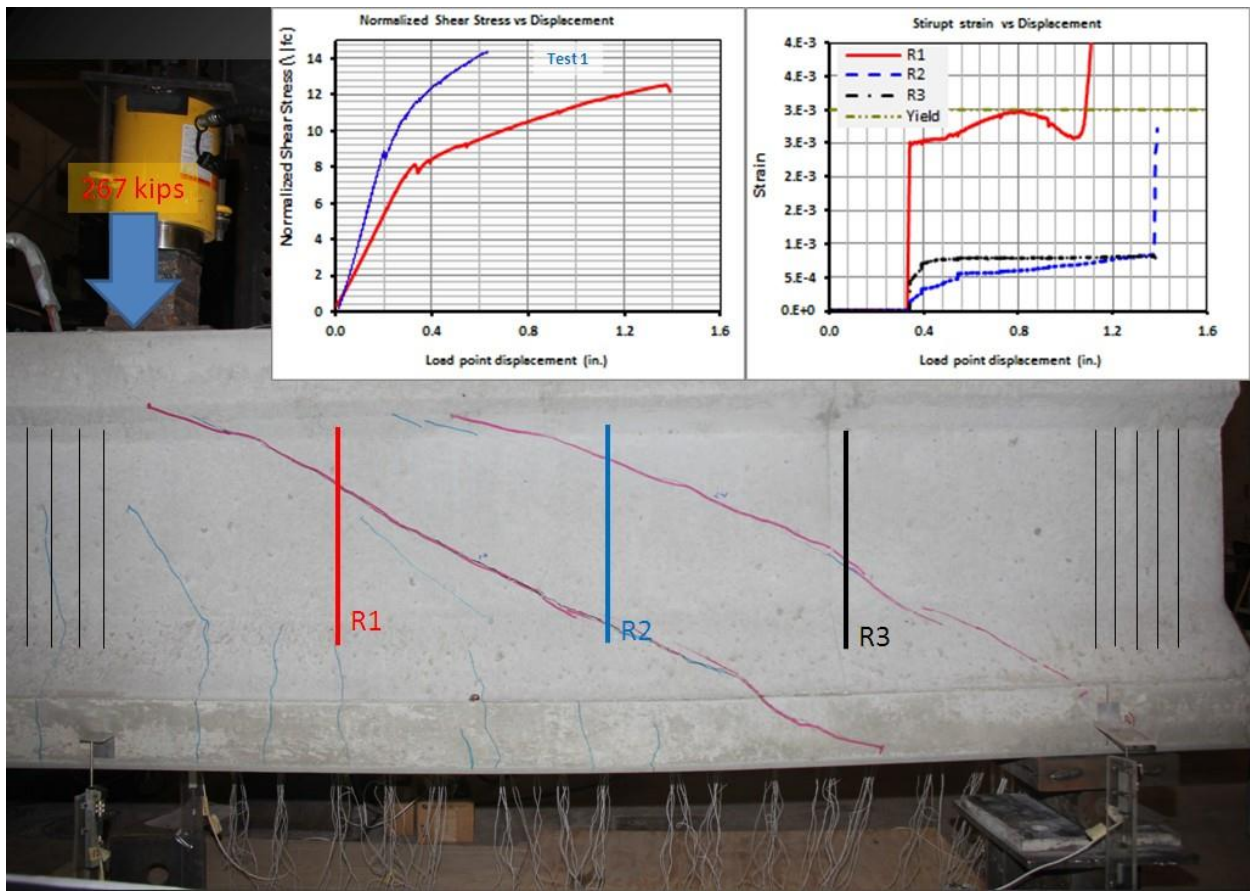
Beam 2 Test 2 Peak Load Before Failure.
